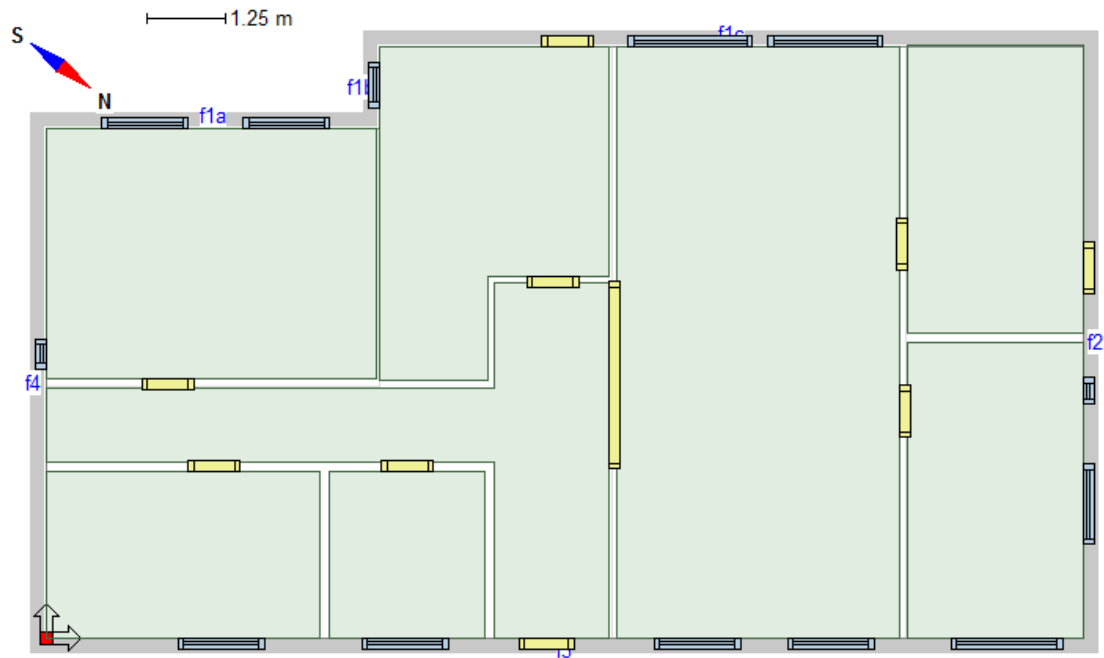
Floor plan drawn in IDA ICE for house number two, 1980
